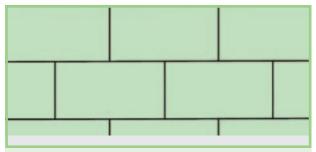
Pattern of Styrodur C boards with staggered joints. Avoid cross joints.
